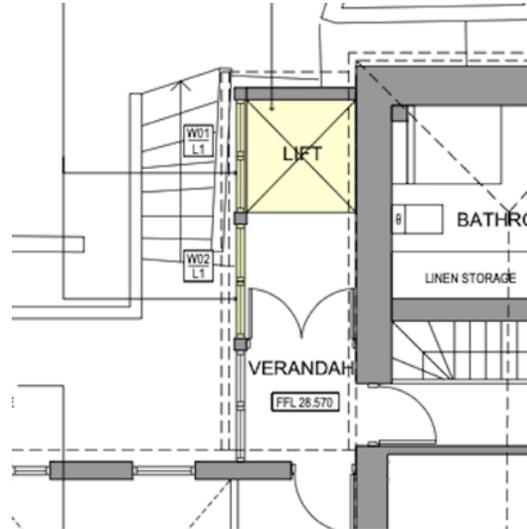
, Proposed first floor level lift access, Michael Cumming Architect, 24.02.23
